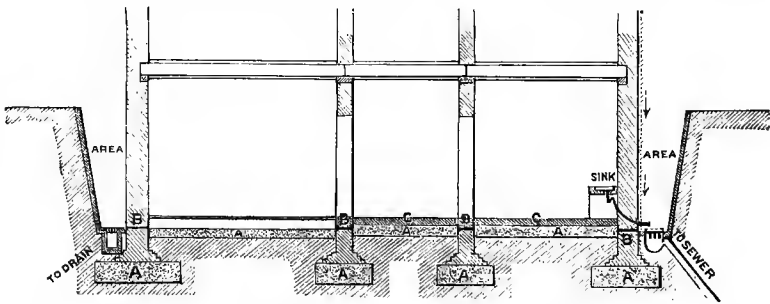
Basement Floor. Arrangements to exclude ground-air and dampness. A, concrete bed; B, damp-proof course; C, asphalt floor.
